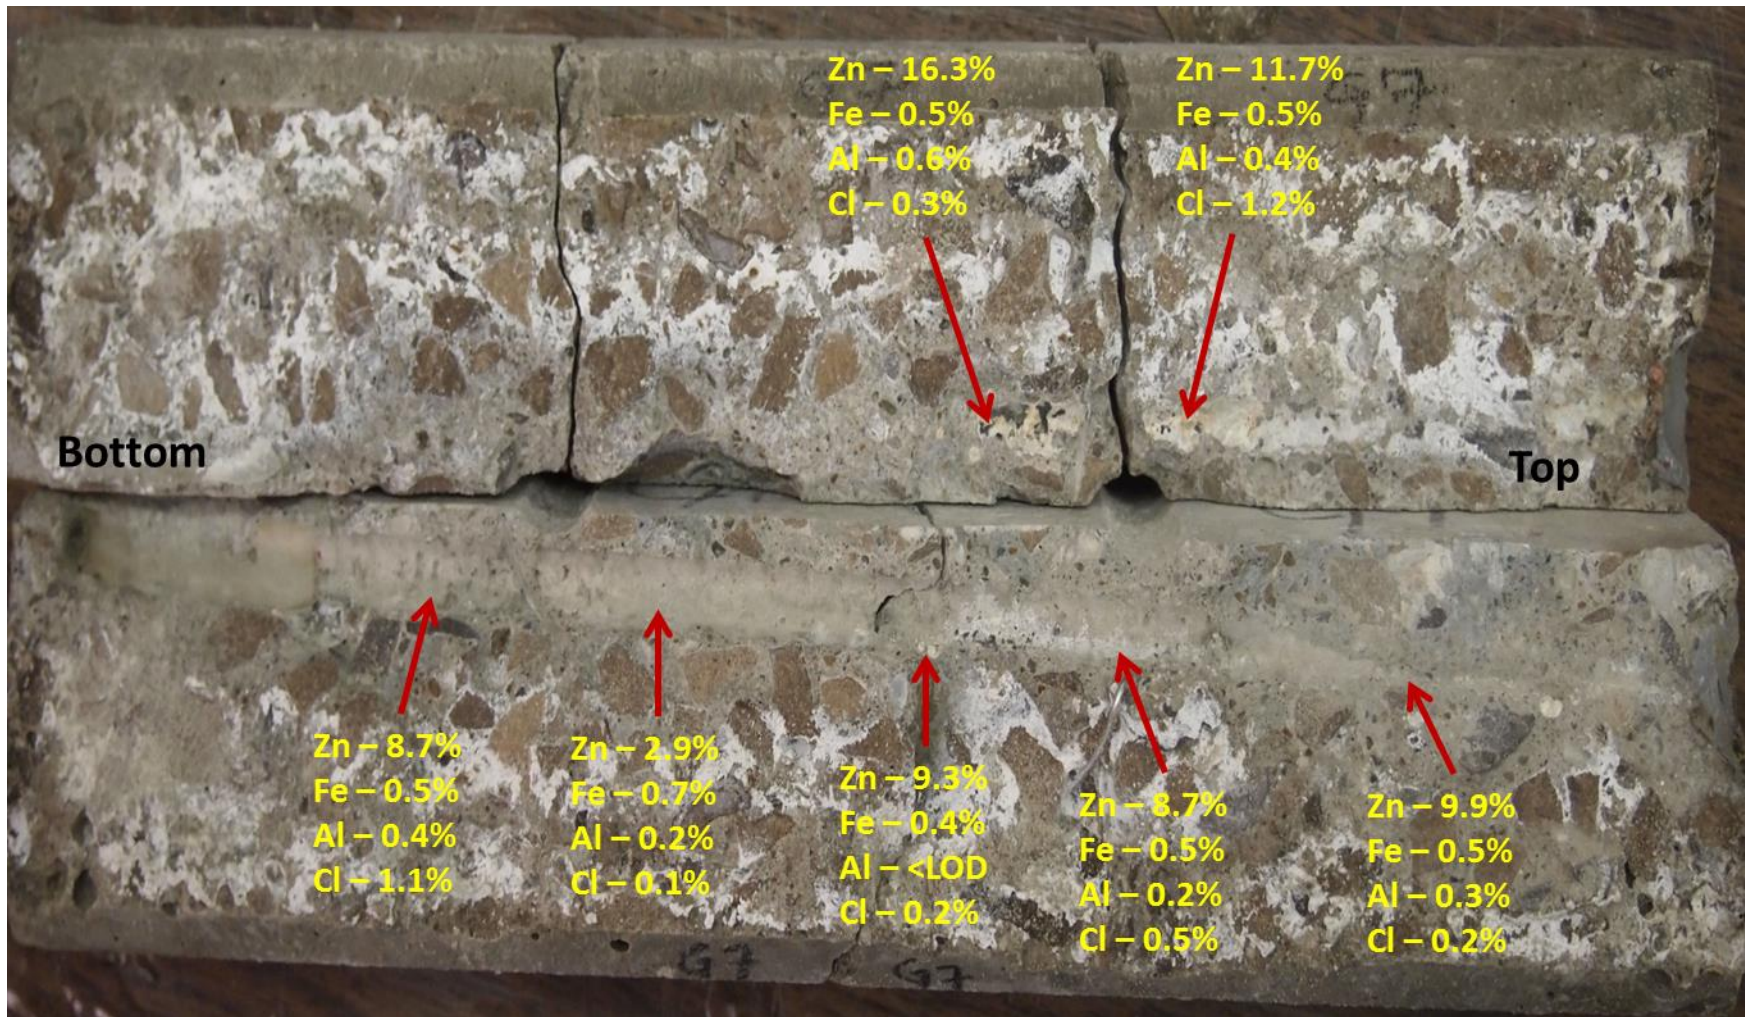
XRF analysis of autopsied longitudinally cracked HDG concrete specimen.
